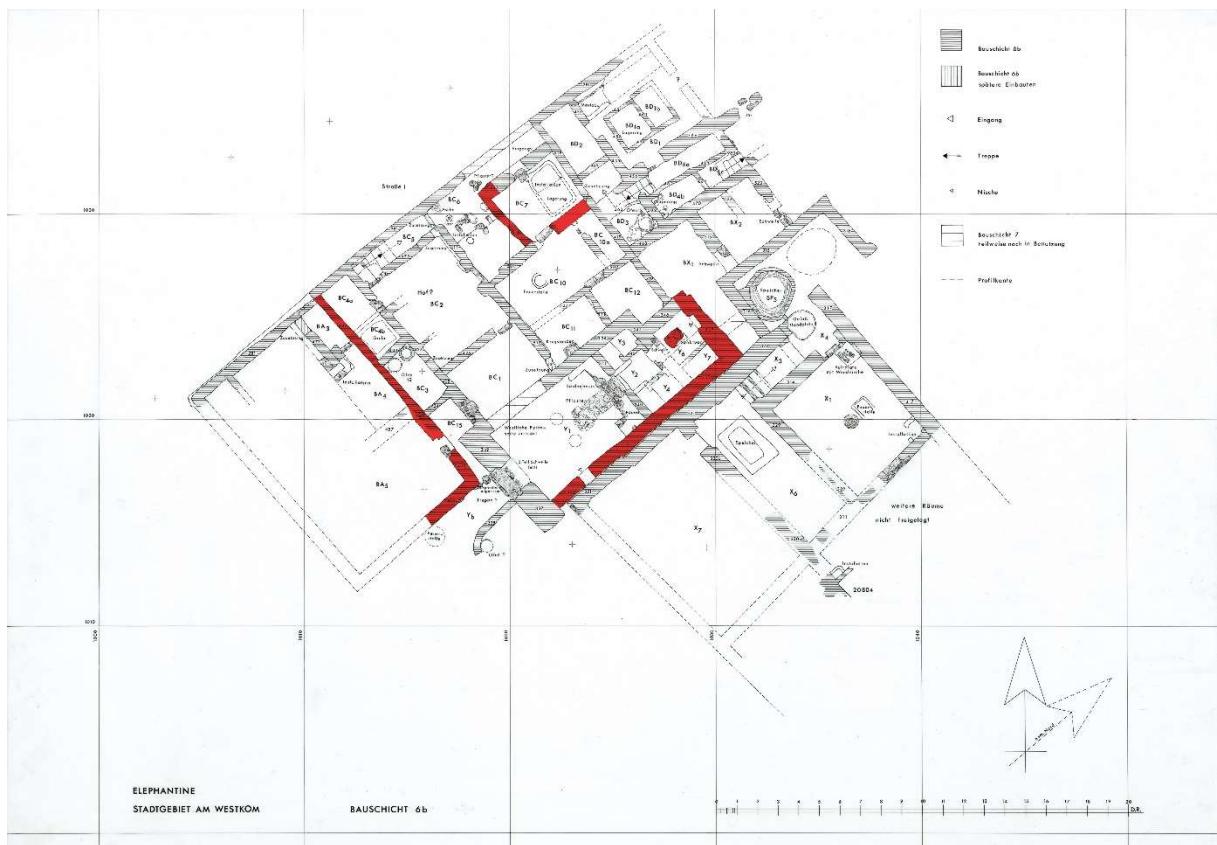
Western Town, consolidated mud-brick walls (red) in level 6 b (plan: A. Krekeler © DAI)
